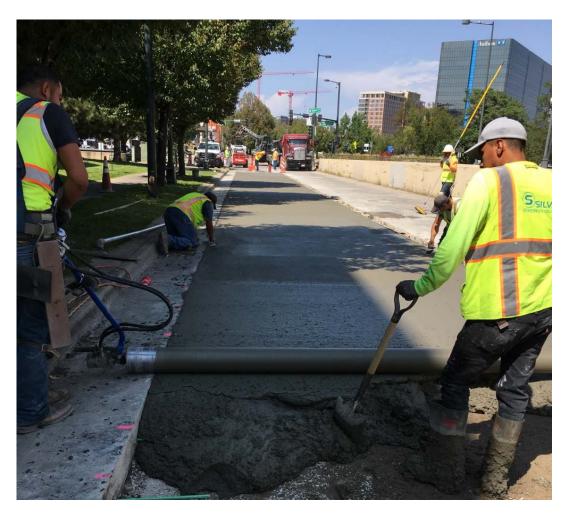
One of Two New Trial Sections of Concrete Pavement in second trials
